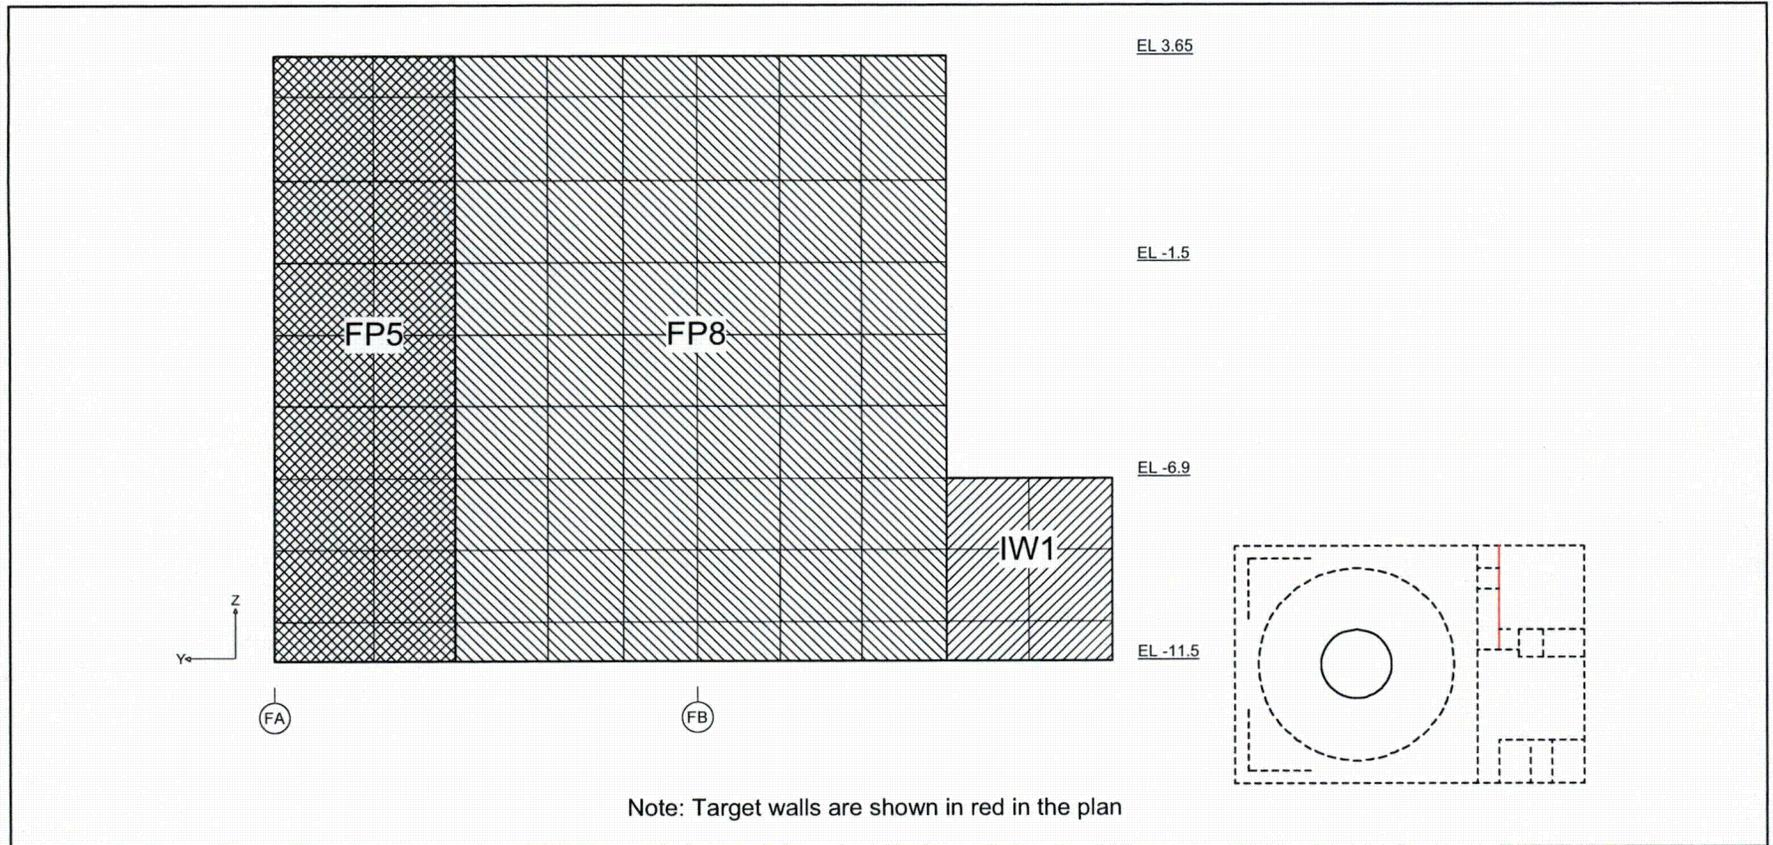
Application of Thermal Load on the Spent Fuel Pool Wall-3
